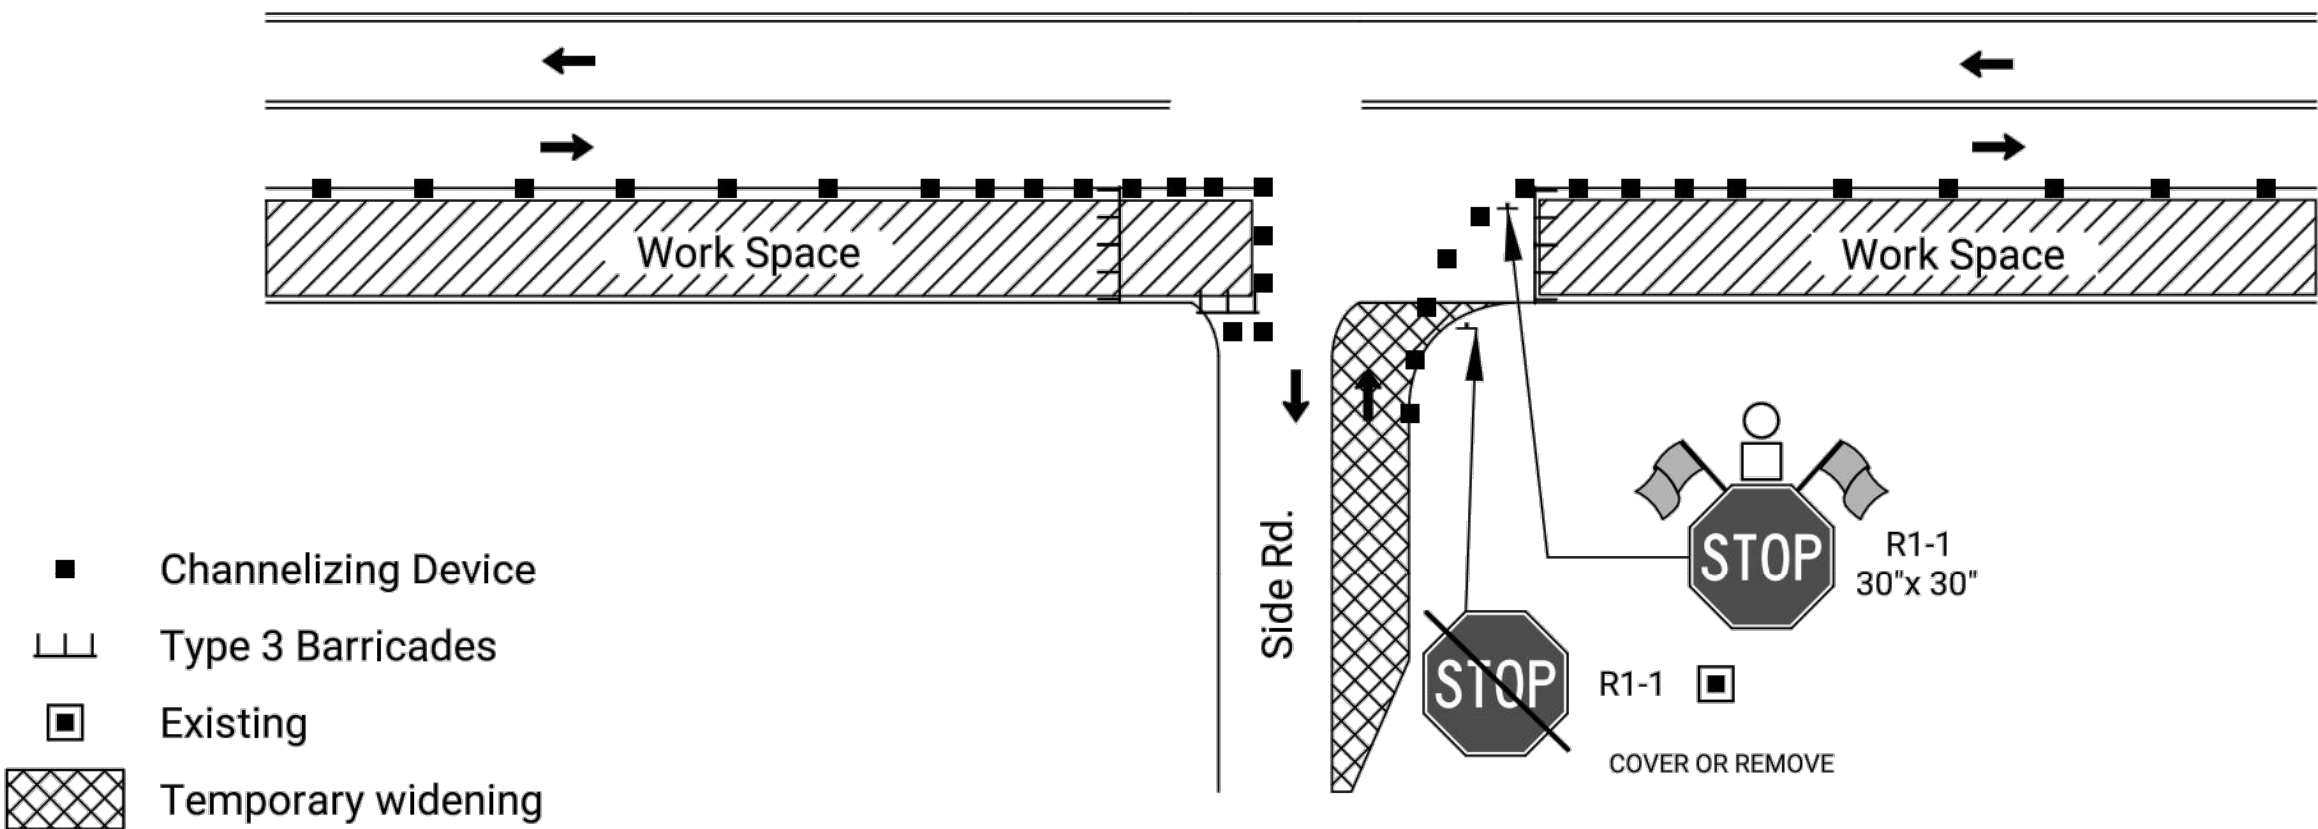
SIDE ROAD OR ENTRANCE CONSTRUCTED HALF AT A TIME:
